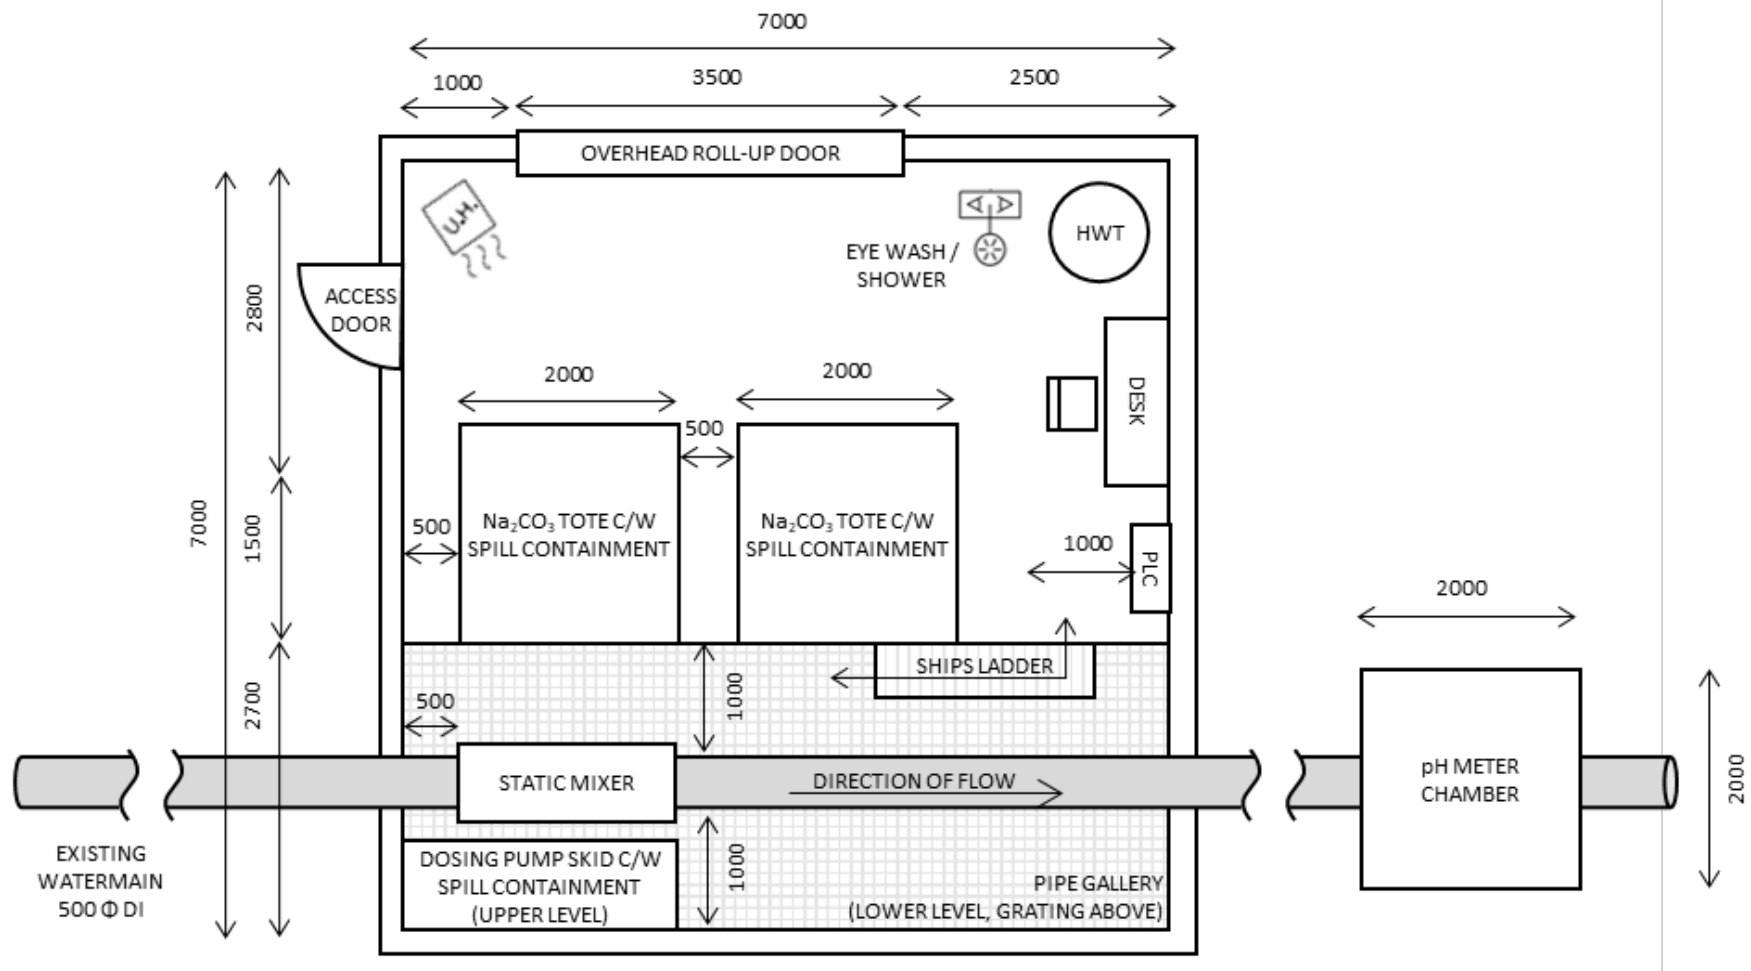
Proposed Main #15 Facility Layout (Concept Level)
